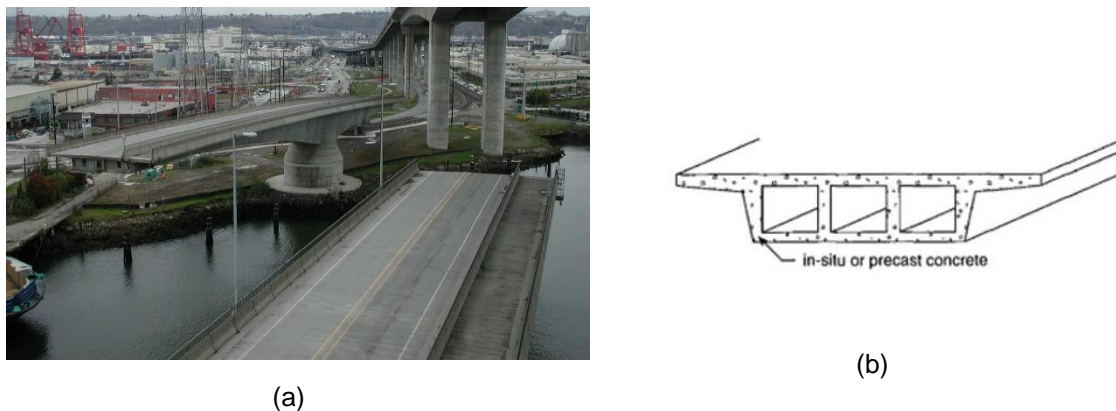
(a) Spokane Street Swing Bridge (Yashinsky, 2010) (b) Concrete deck (O'Brien & Keogh, 1999)
